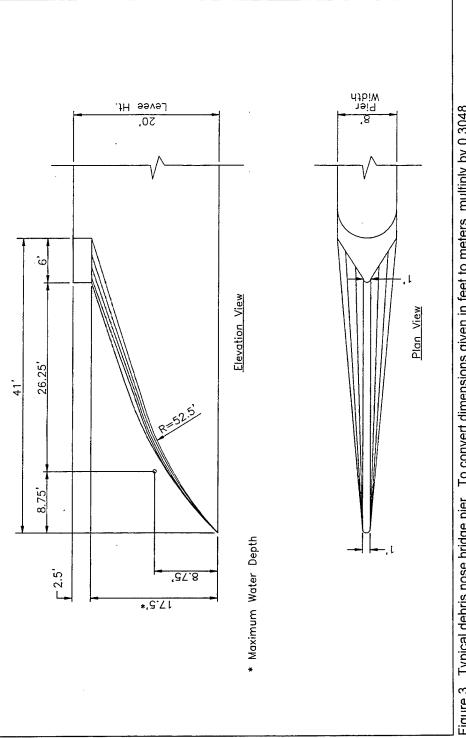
Typical debris nose bridge pier. To convert dimensions given in feet to meters, multiply by 0.3048.
